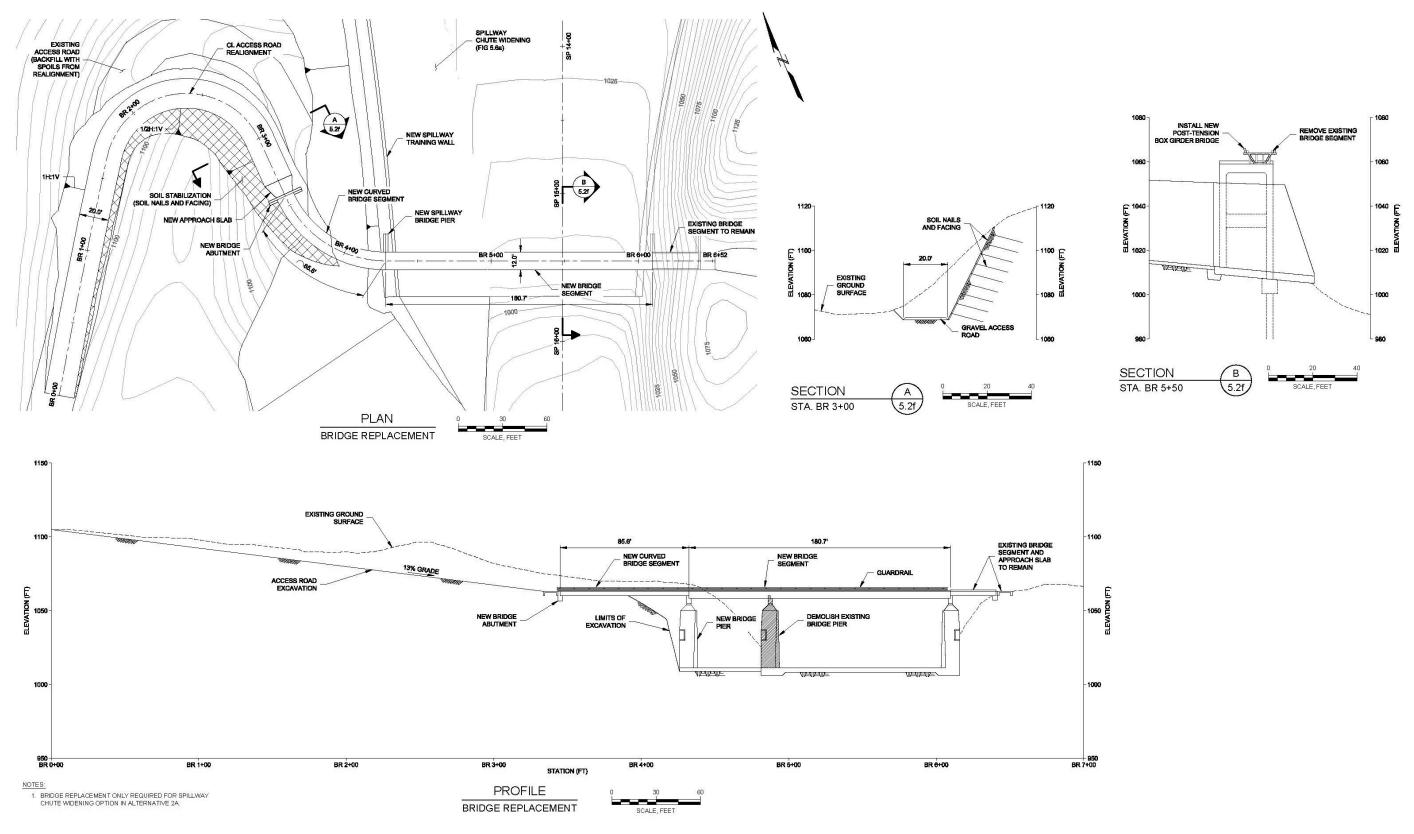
Labyrinth Weir Spillway and Spillway Widening Option Bridge Replacement
